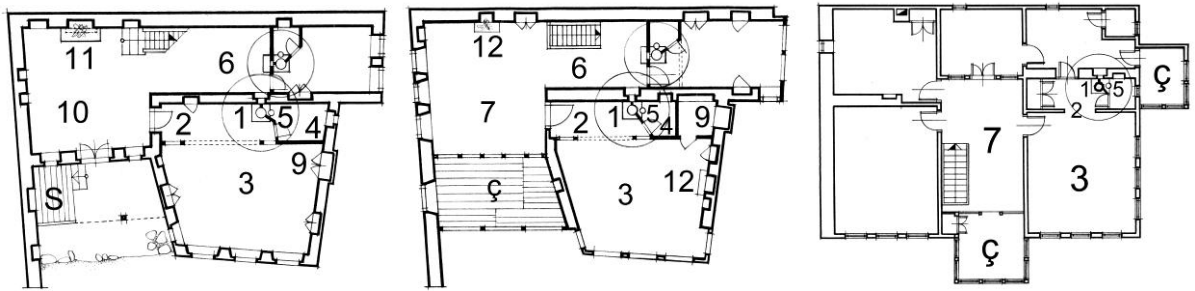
Ground floor layout of the house [H-“T.Ç.P.”], built in Prizren
